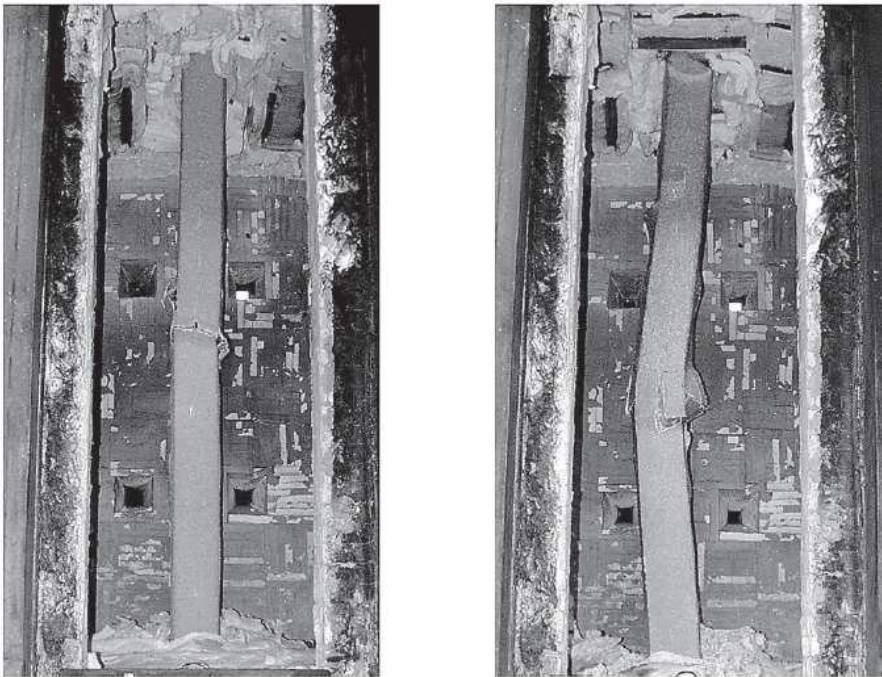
Typical failure mode of the tested RHS columns, of tests performed by Han (Han et al., 2003)
